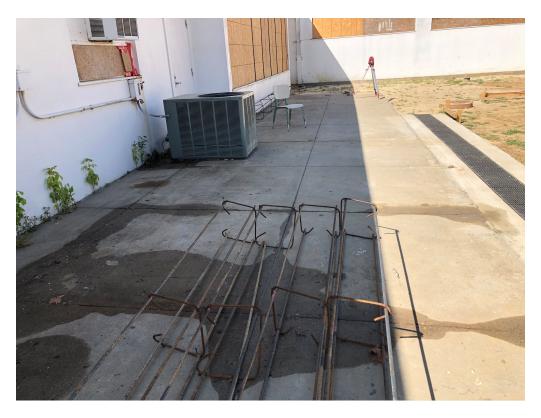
Rebar Prepped for Installation at Footing Excavations
